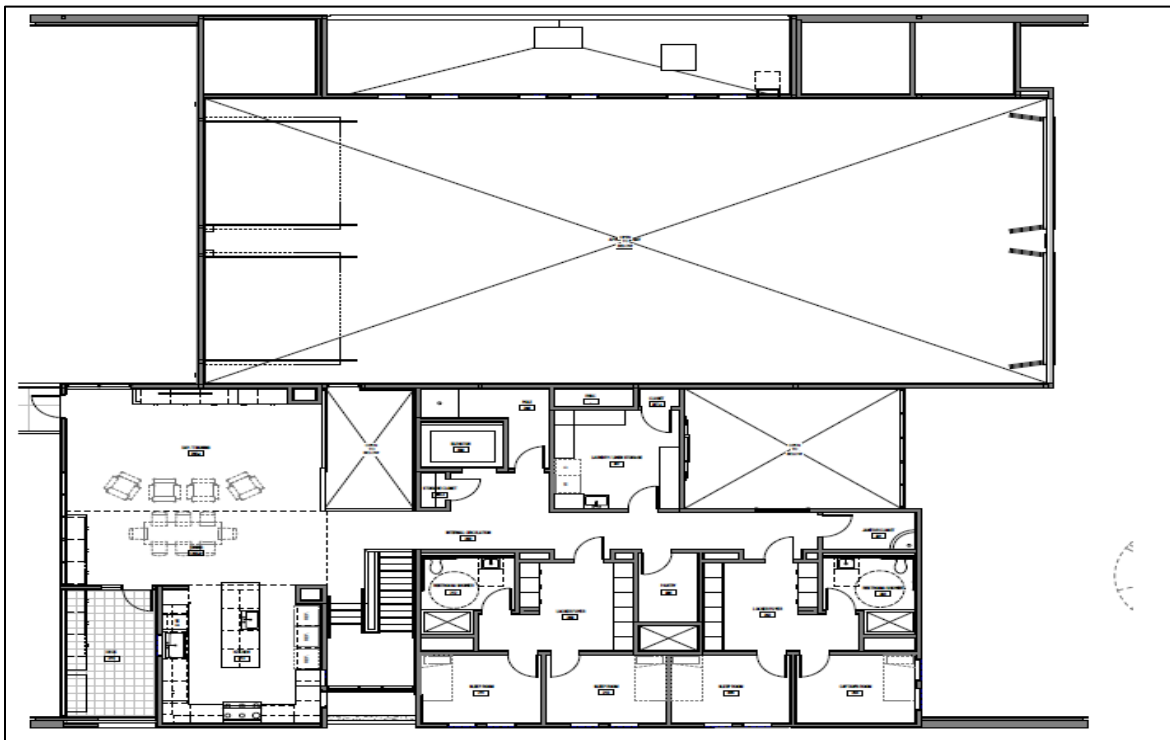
Proposed Fire Station 23 - Second Floor Plan
